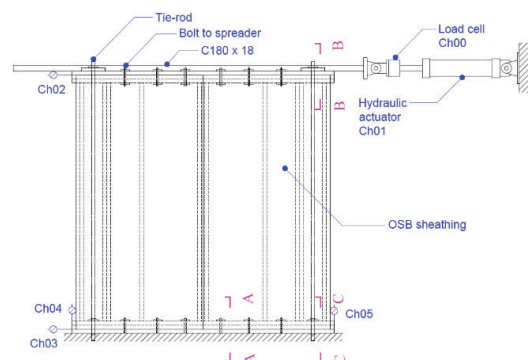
Shear wall with three rows of nails [4] (Unit: mm)
